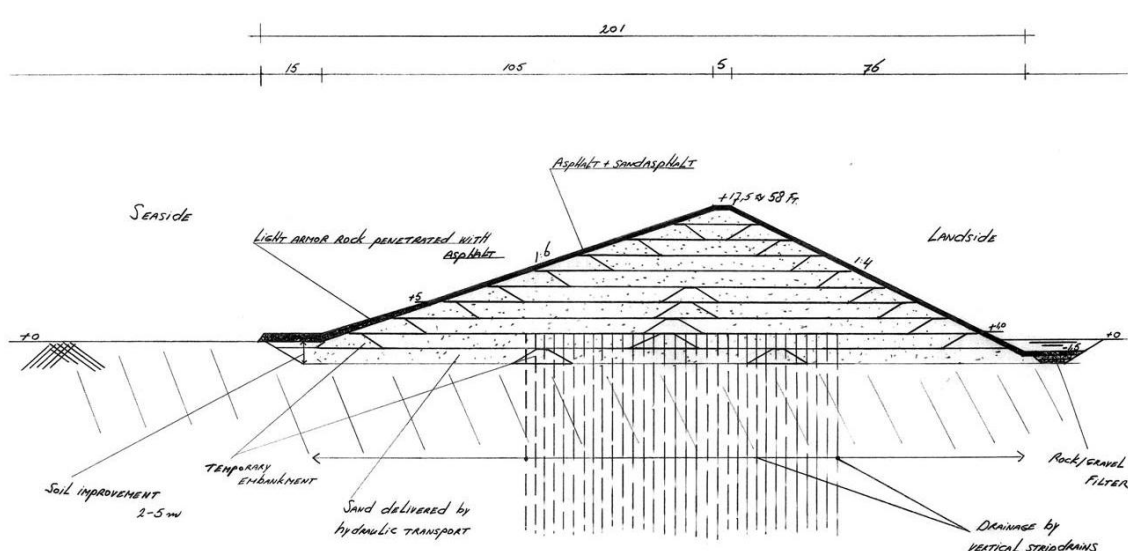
Typical cross section for a traditional levee design (measures in metres)
